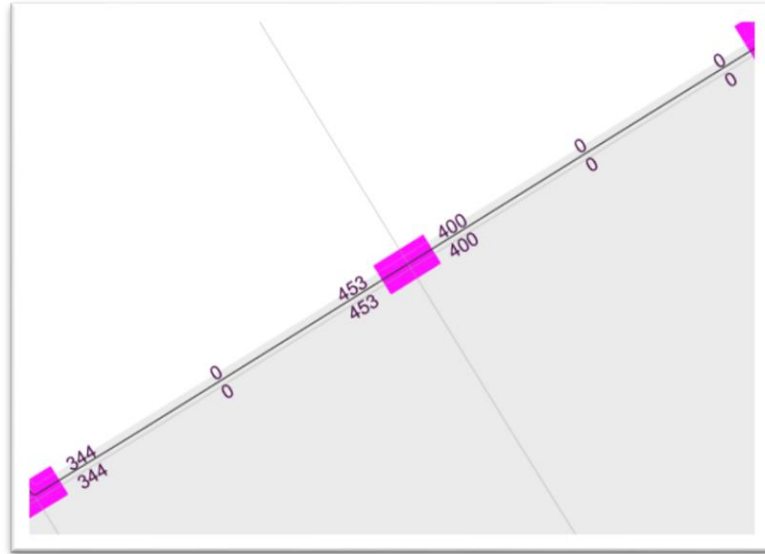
Torsional longitudinal reinforcement for beam B7 & B8 in ETABS.
